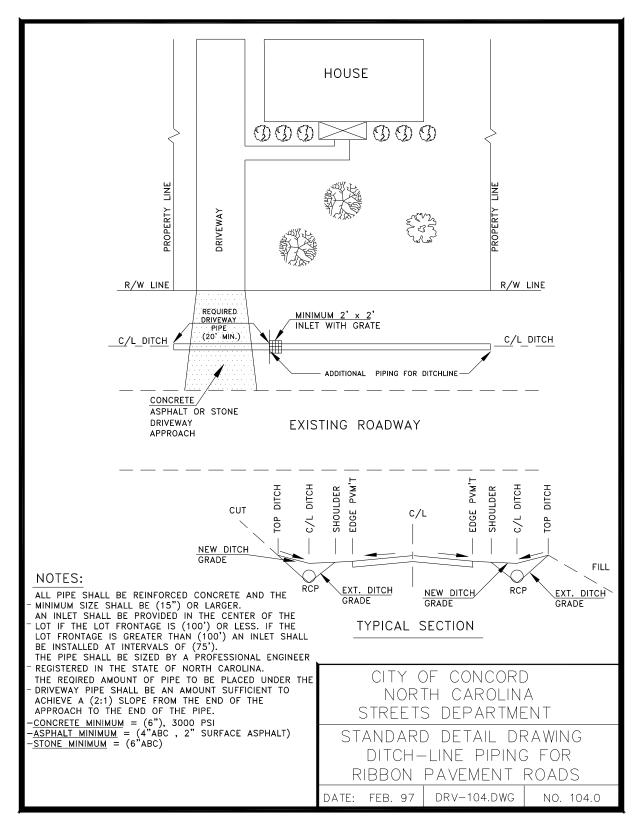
Ditch Piping for Ribbon Pavement Streets.
